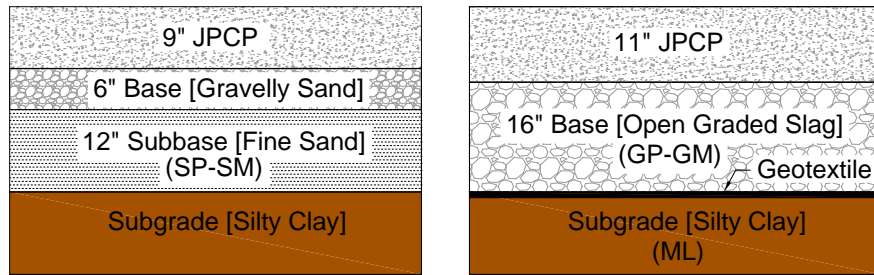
Cross sections of the existing (built in 1969; left) and the new (built in 2010; right) pavement layers
